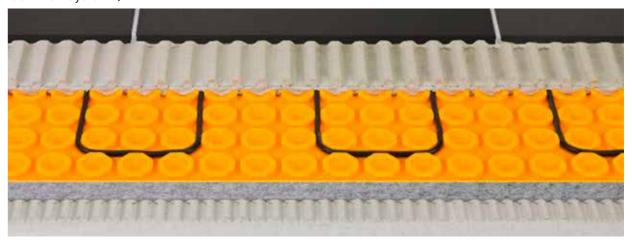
Electric mat with heating cables and DSDI plates as thermal insulation
